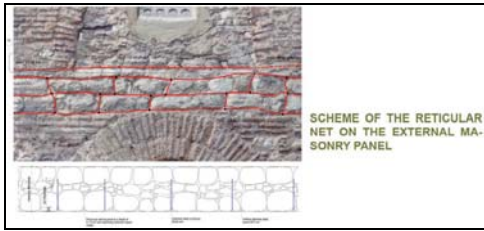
The Structural project: the scheme of the reticular net on the external masonry panel
